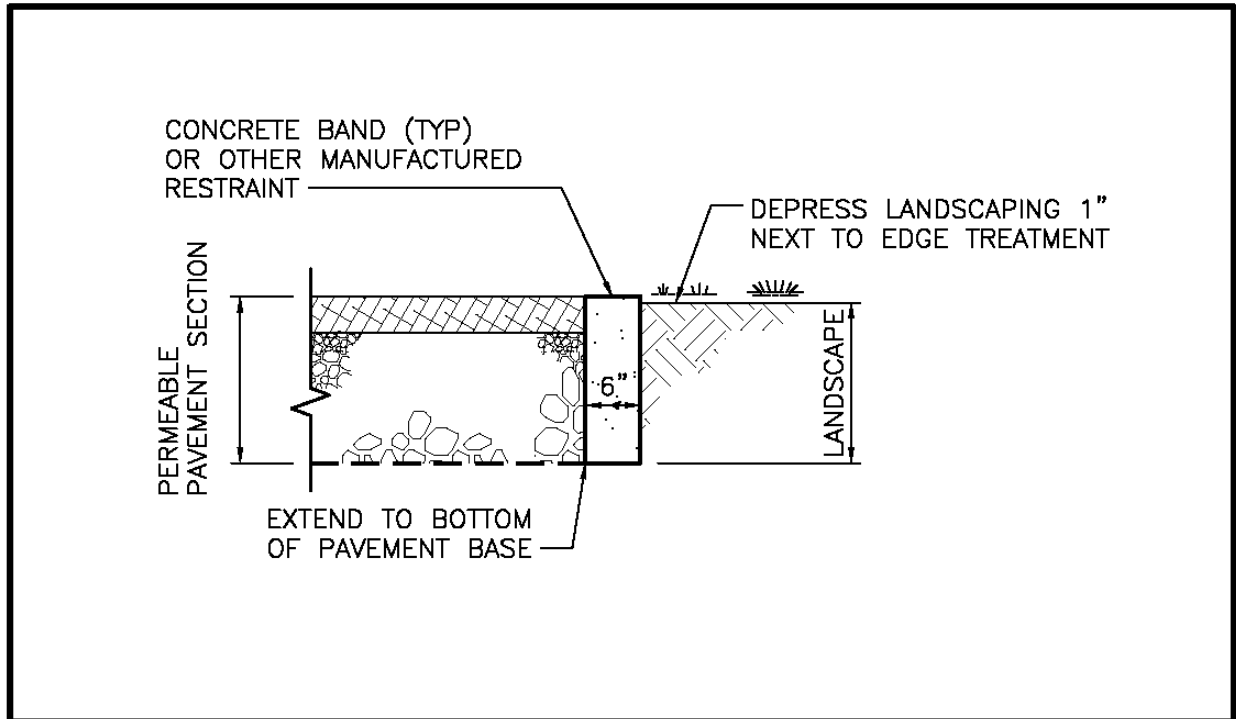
Example Permeable Pavement Concrete Edge Treatment.
